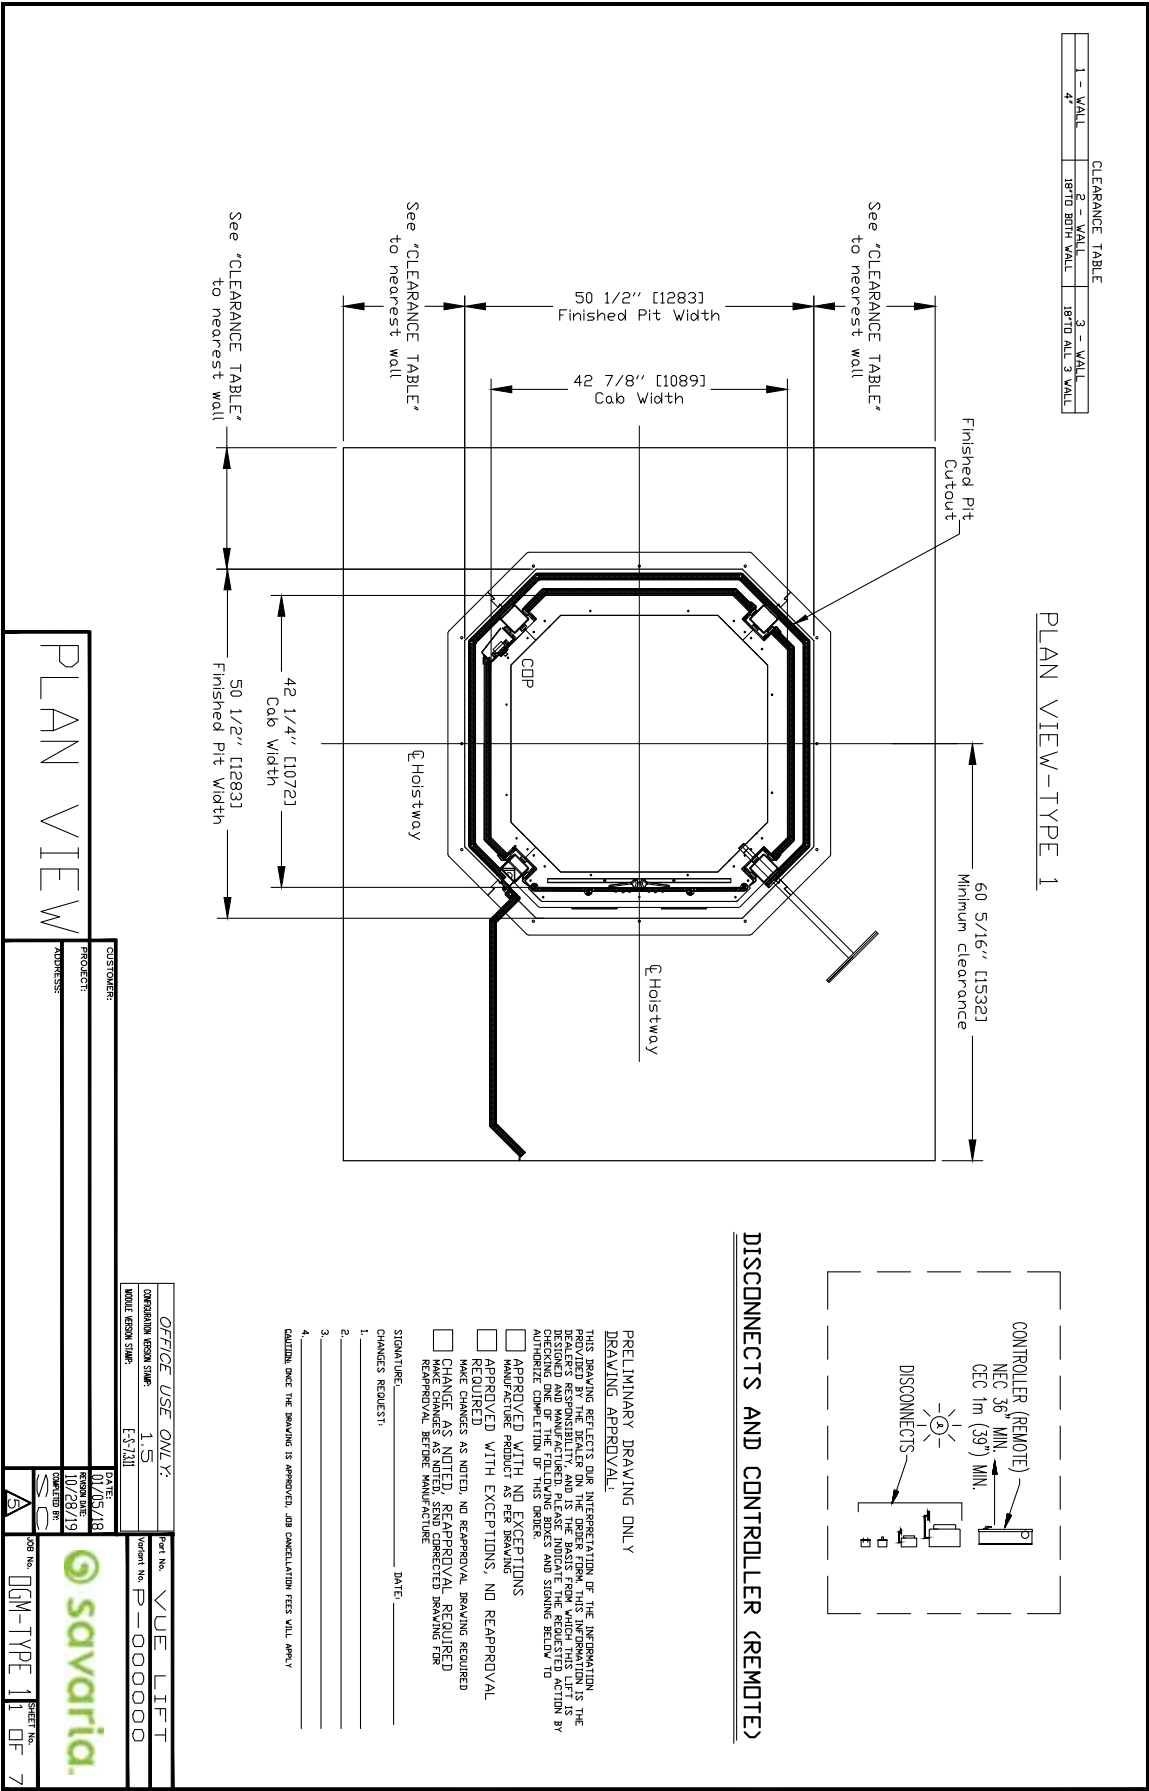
Pit/bottom floor/thru-floor view (OGM, type 1)
